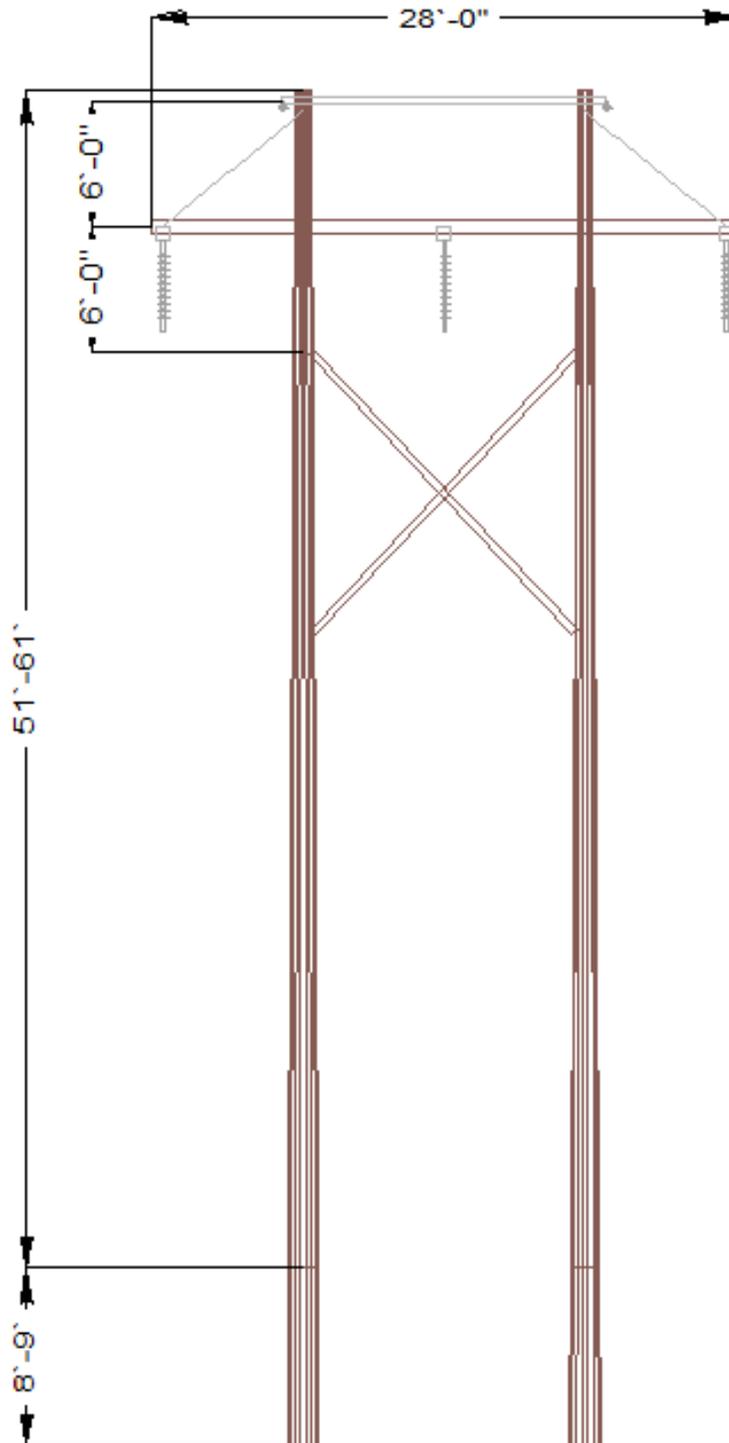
Proposed Route Rebuild Single-Circuit 138-kV Wood H-Frame Structure
